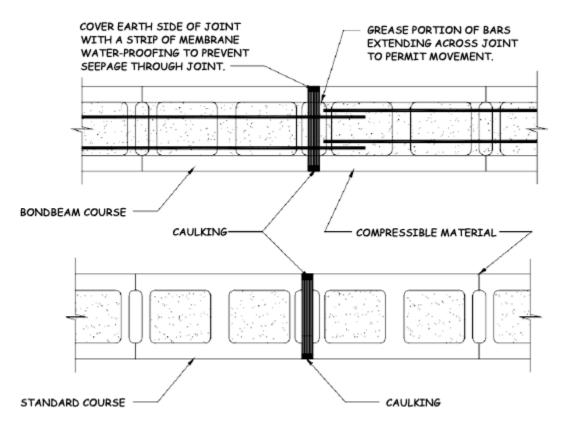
TYPICAL REINFORCEMENT DETAIL
